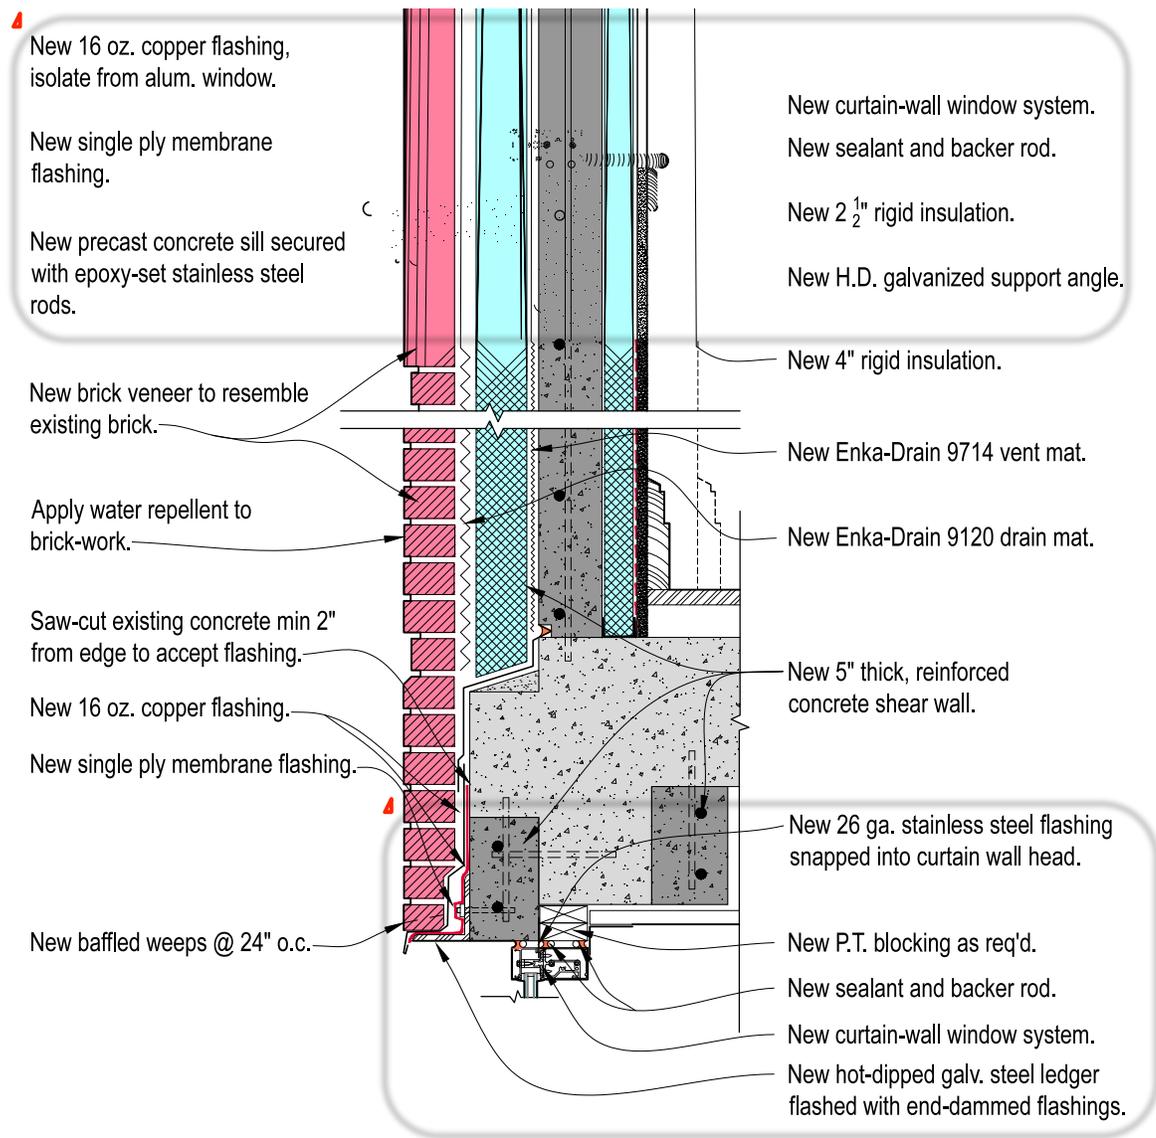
(2): Window Head & Sill Installation at Typical Brick Wall Loc.
